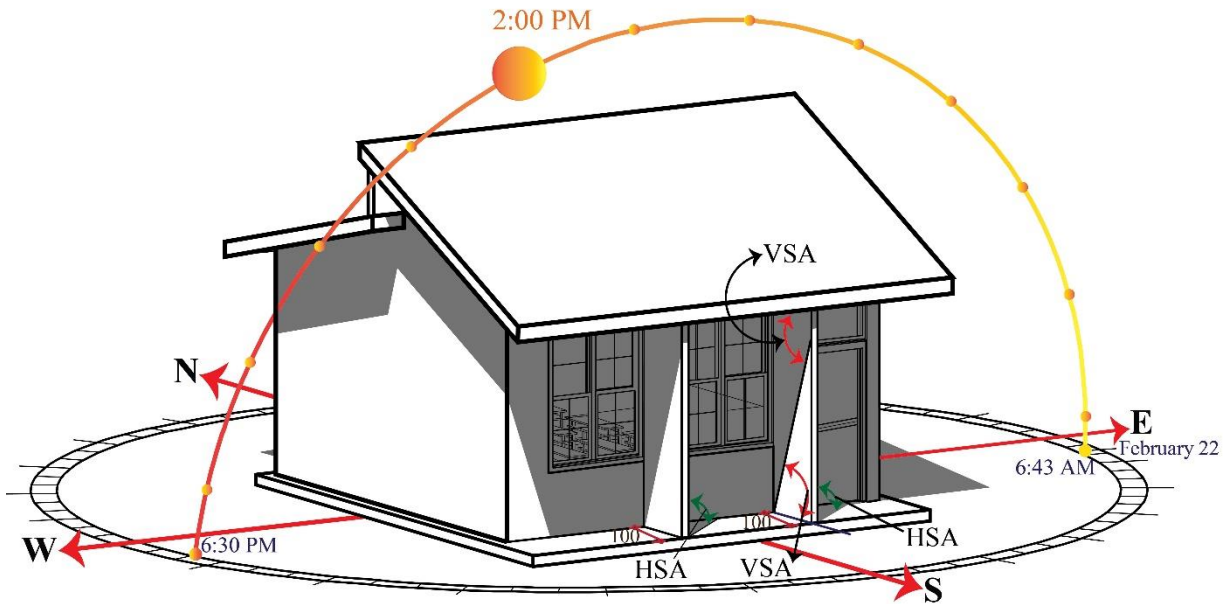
22 South oriented classroom building shaded with roof eave overhang and wing wall
